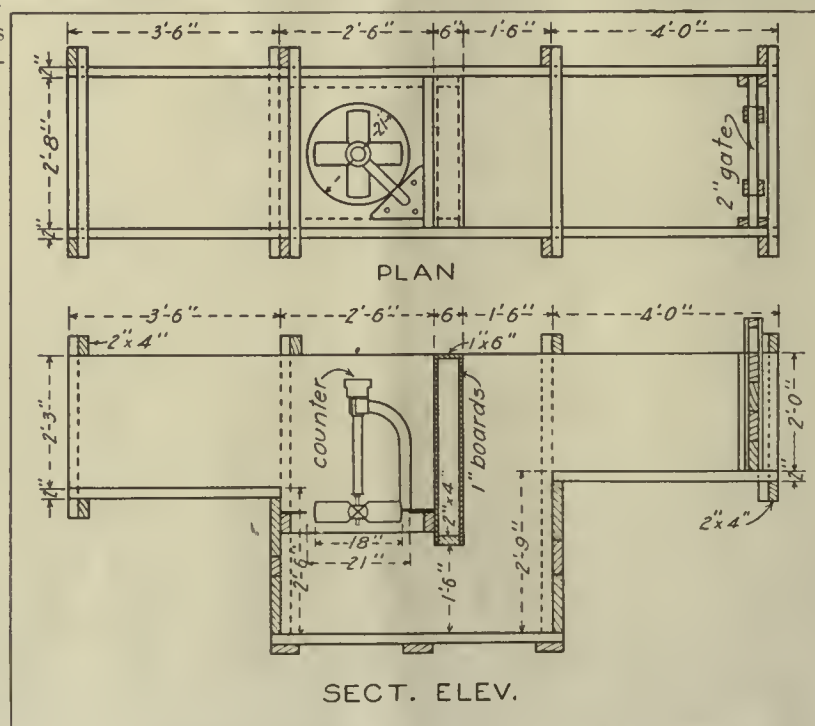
Plan and elevation of installation of Grant-Mitchell meter.
